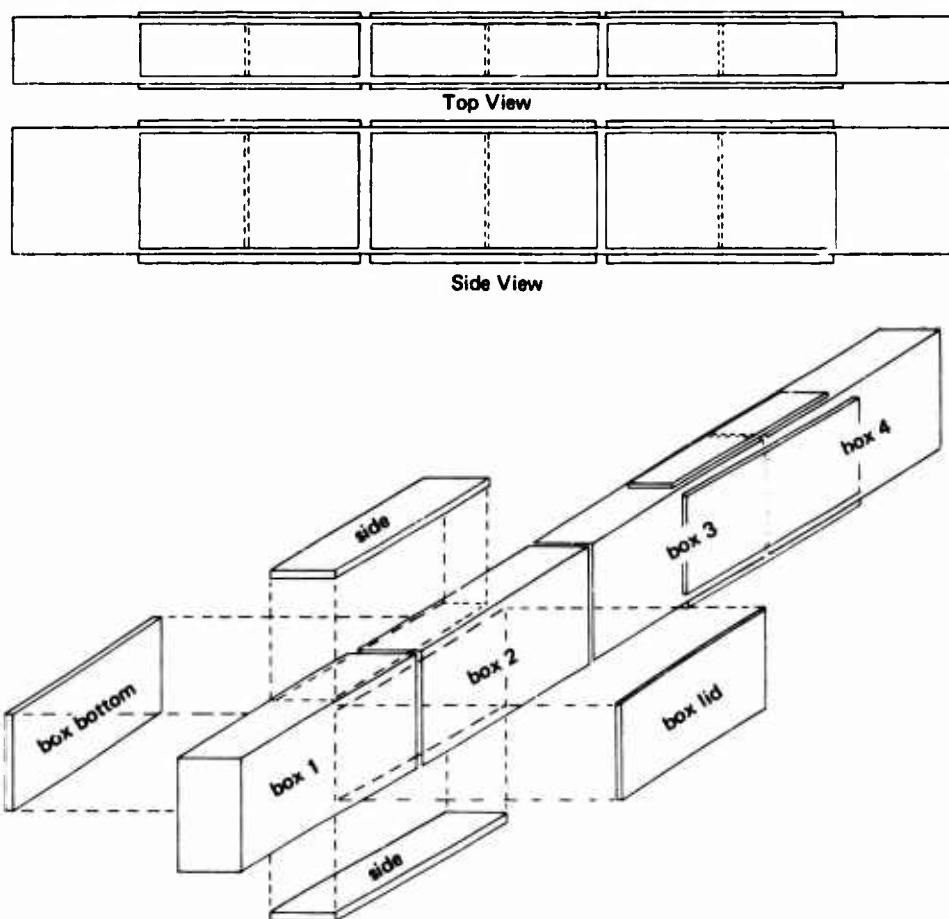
Construction plan for beam made from four 81-mm ammunition boxes (7-foot clear span).
